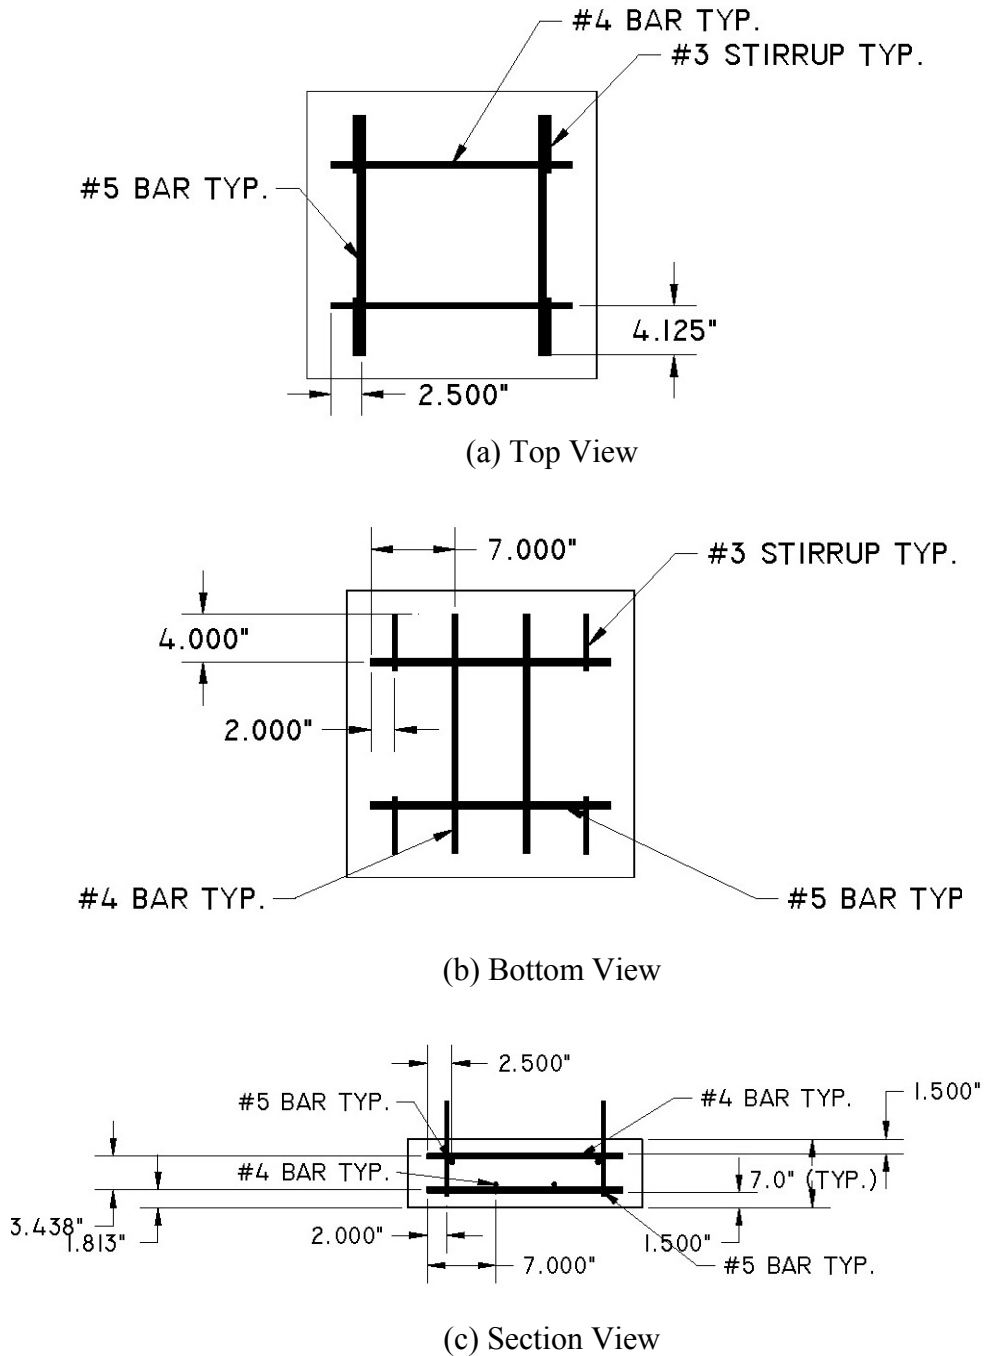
Reinforcing cage for single-shear connector test specimen
